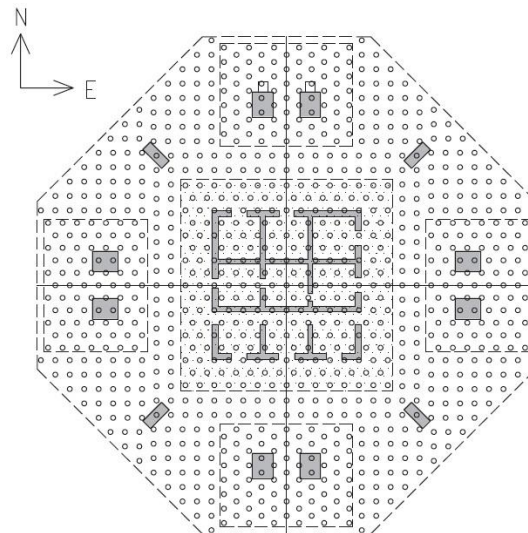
Arrangement of piles of Shanghai Tower – plane (Tang, et al., 2014)
